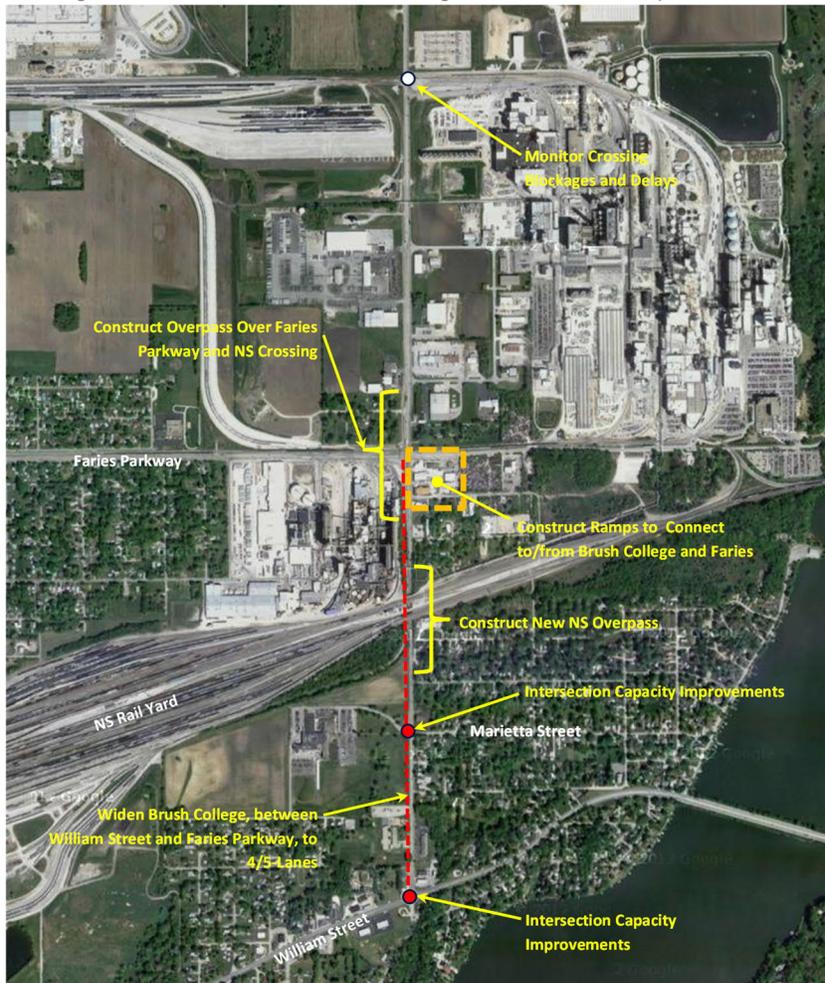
Proposed Brush College Road Overpass at NS Railyard
